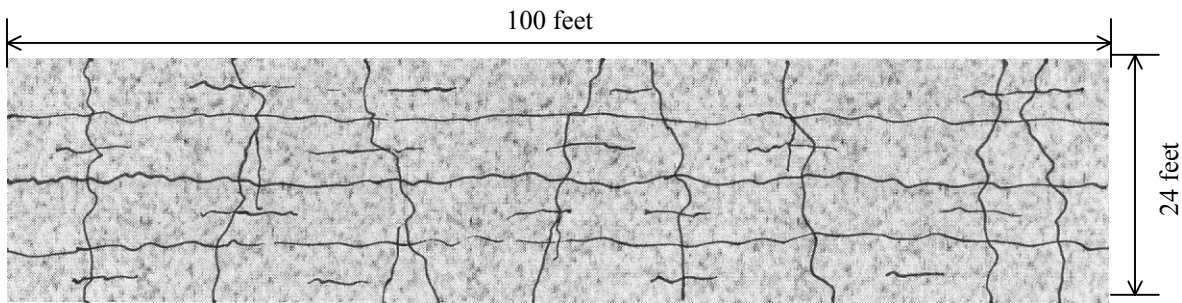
2,400 ft² Section of Roadway with about 300 Feet of Cracking
